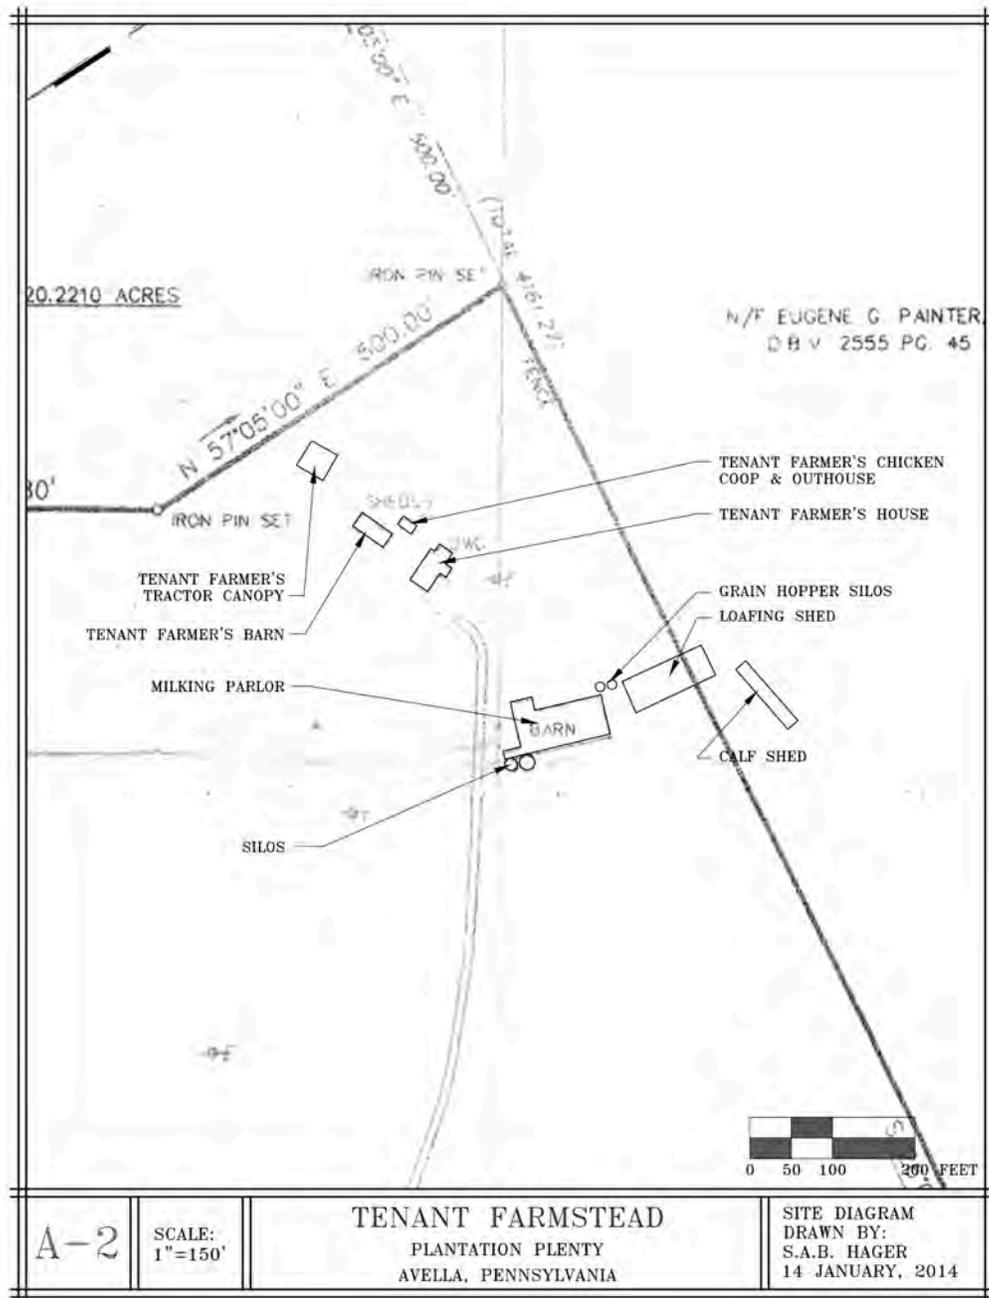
Plantation Plenty Tenant Farmstead Detailed Site Plan
